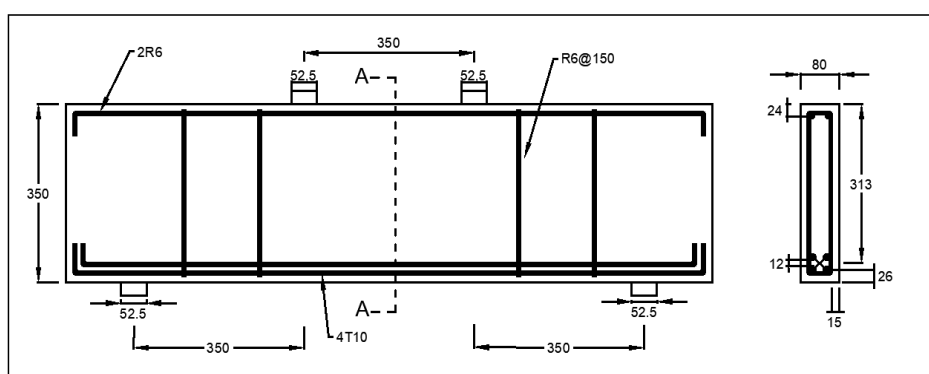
Detailing of Reference Beam, R-01 (Zhang and Tan, 2007).
